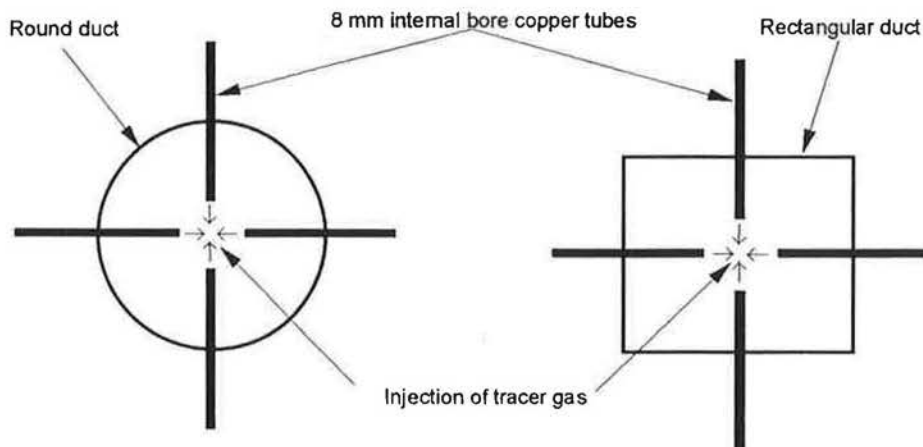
Schematic of injection using 8 mm internal bore copper tube
